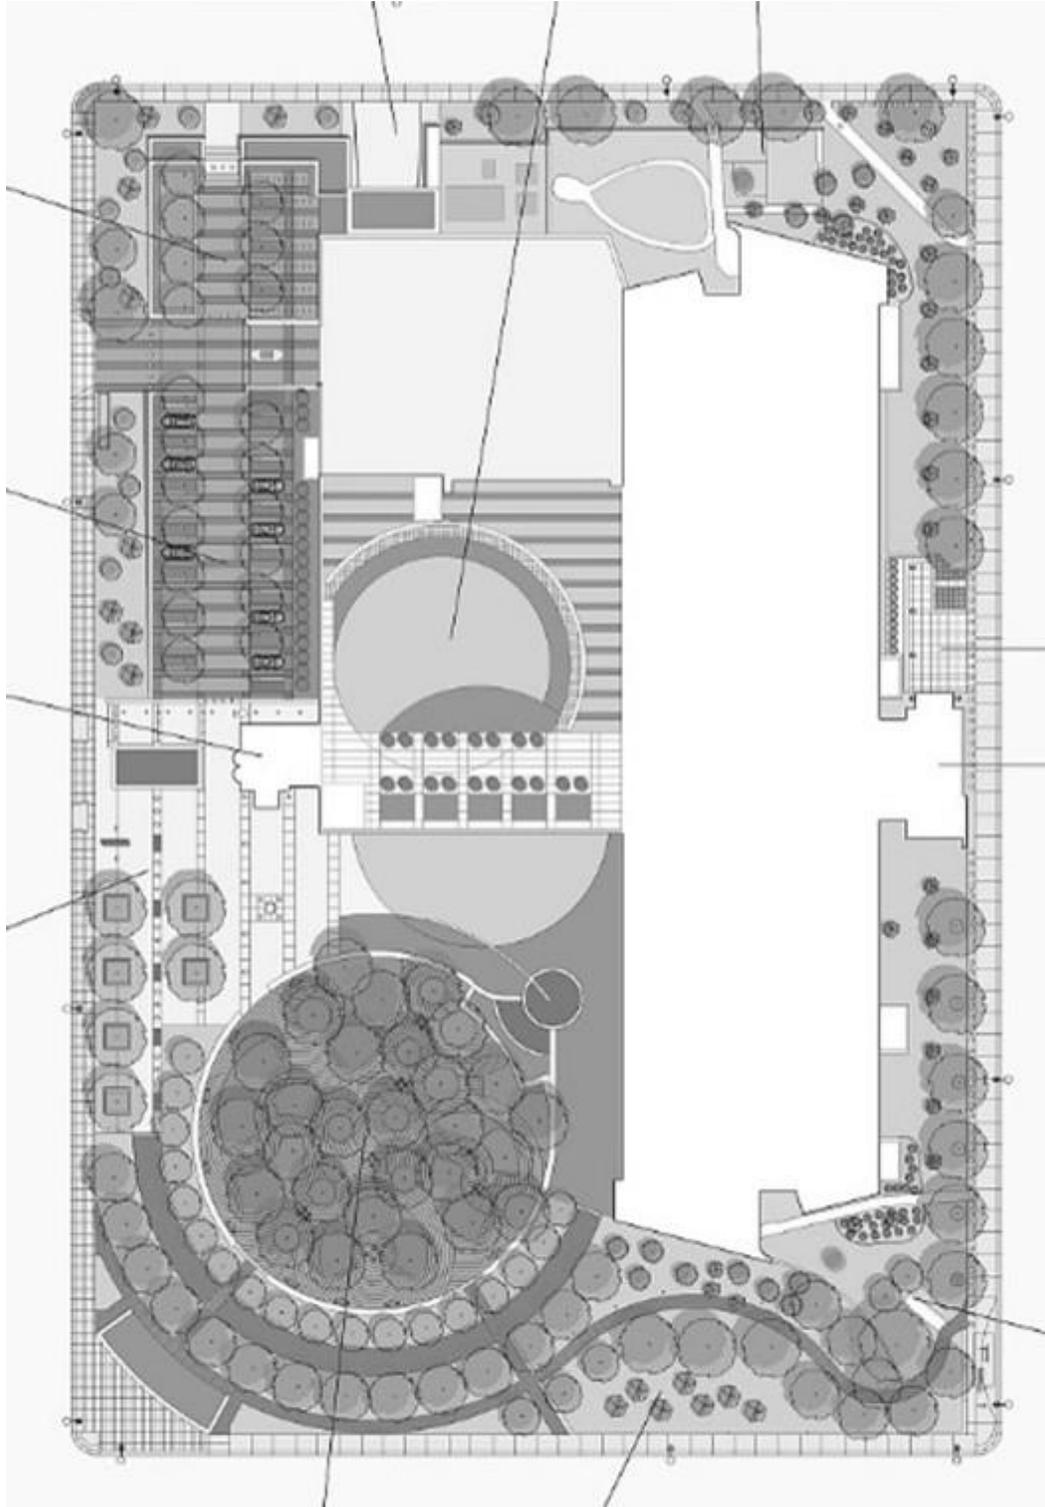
Richard Bolling Building Site Plan, 2008 (west at bottom of drawing)
